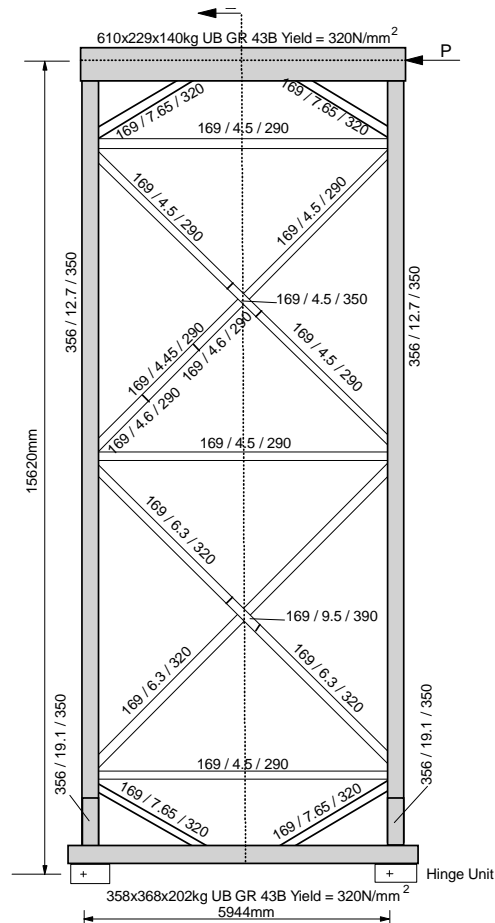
Elevation and properties of the tubular frame (frame 1), used in the benchmarking exercise<sup>1</sup> (Nichols *et al.*, 1994)
